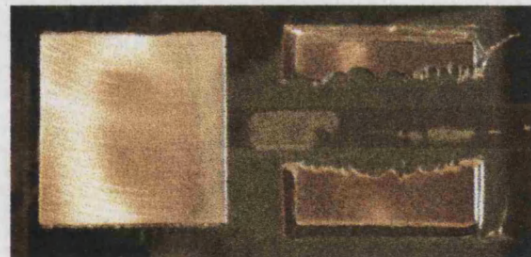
Top of flange after de-bond of tension plate (adhesive removed).
